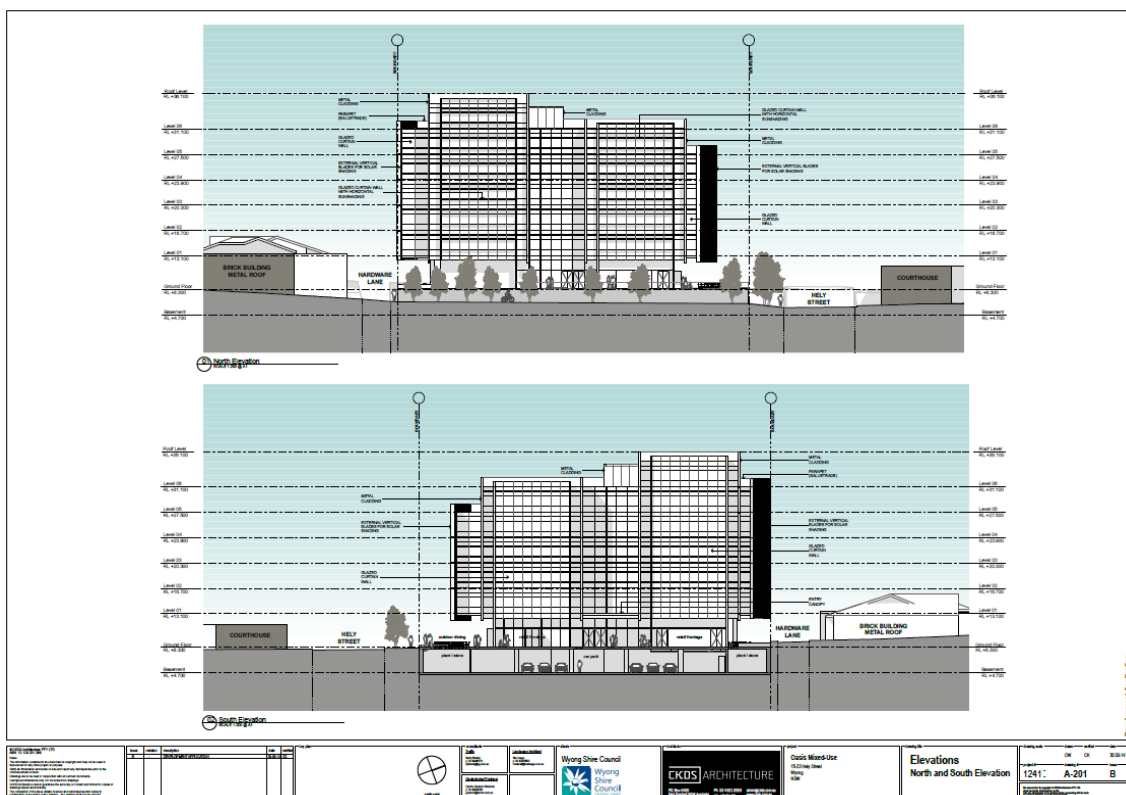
South and north elevations of proposed Stage 1 mixed use commercial and retail development.
